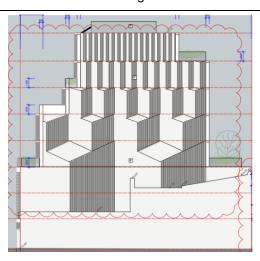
proposed articulation of the precast concrete western boundary wall (Decision Plans)
